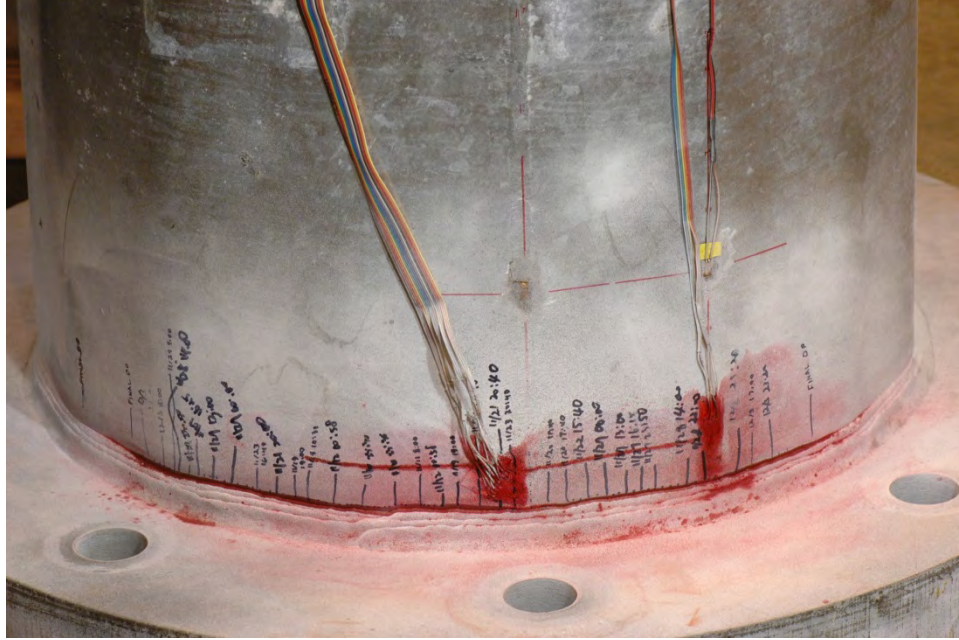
Fatigue cracking in specimen XI-6 from termination of fillet weld toe on the tube wall of both the pole-to-transverse plate weld and the backing ring top weld
